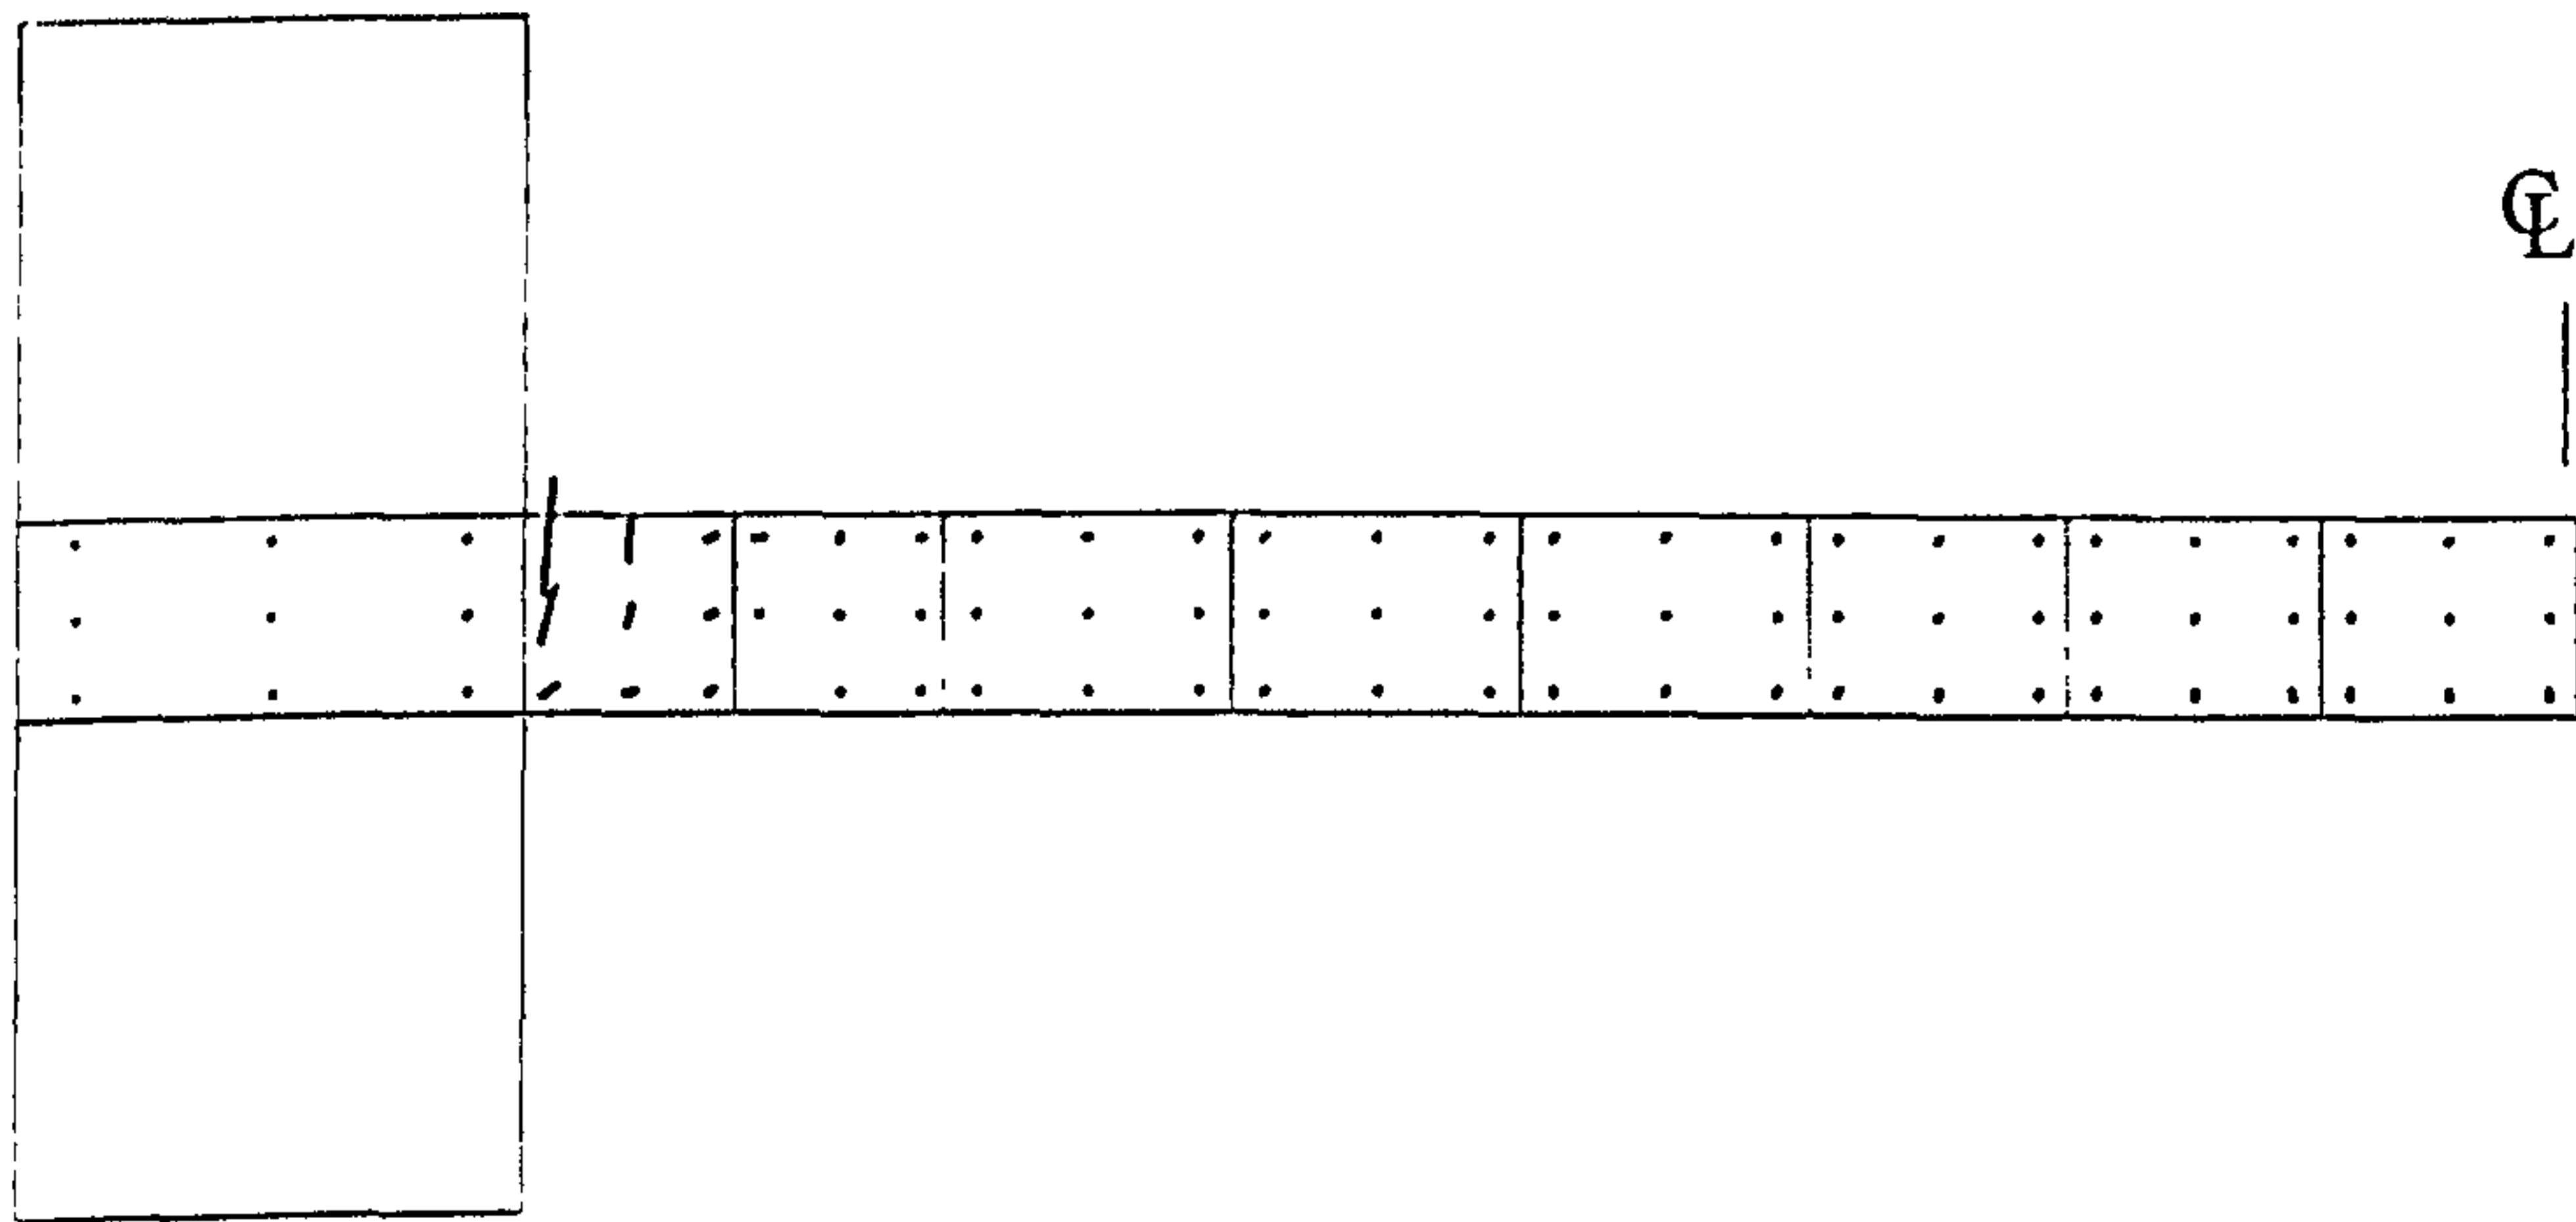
Crack pattern in elevation of slab SE3, flexural failure
